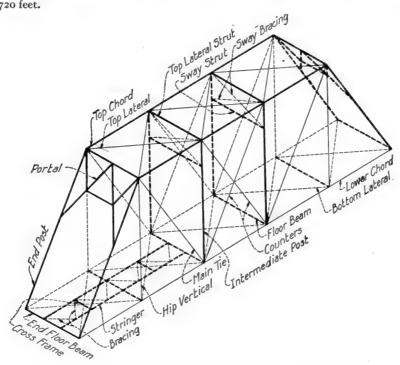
Diagrammatic Sketch of a Railway Truss Bridge.
